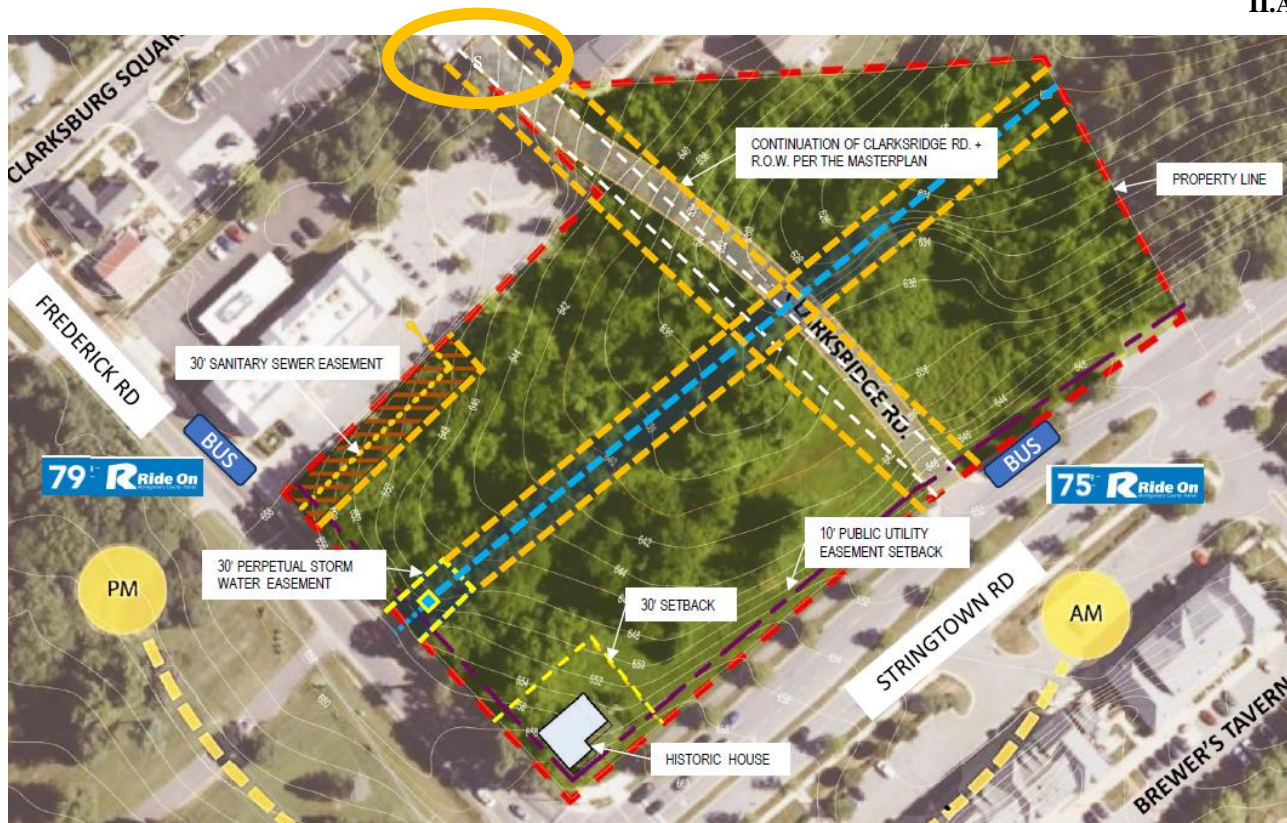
Site plan showing the site with the Day House and stormwater easement. Clarksridge Road is unbuilt on the site, but it shown as completed in this image. The existing Clarksridge Road terminates at the orange circle.
